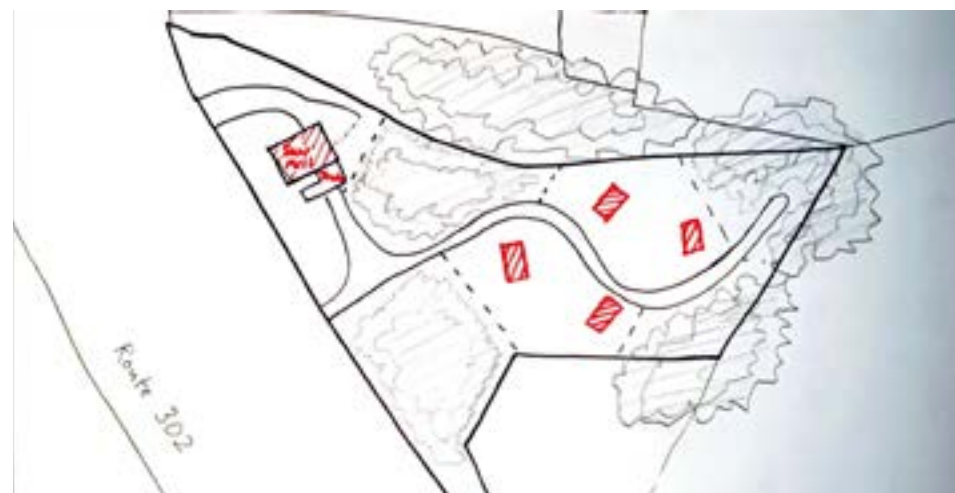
; Master plan for a community forestry infrastructure plan on the site in North Conway
